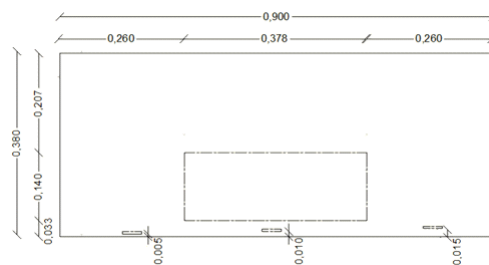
Horizontal section of the concrete wall (all the dimensions are in m).
